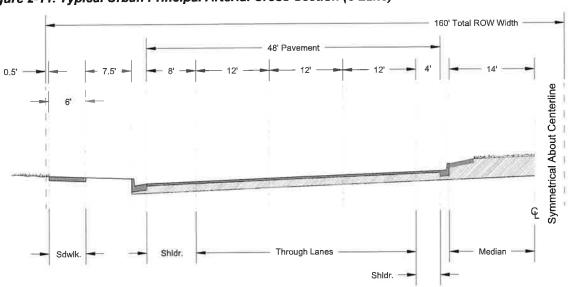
Typical Urban Principal Arterial Cross Section (6 Lane)
